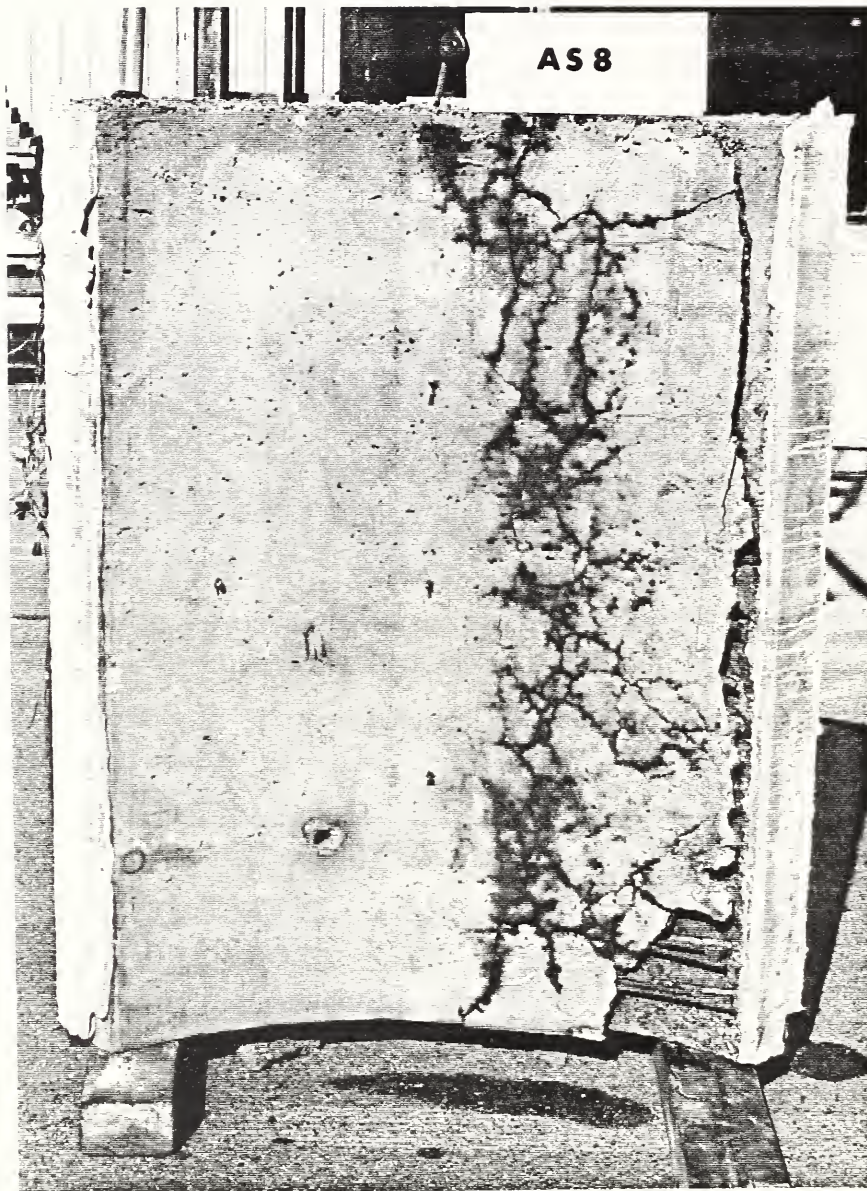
Crack Patterns on the Underside of Specimen AS8
